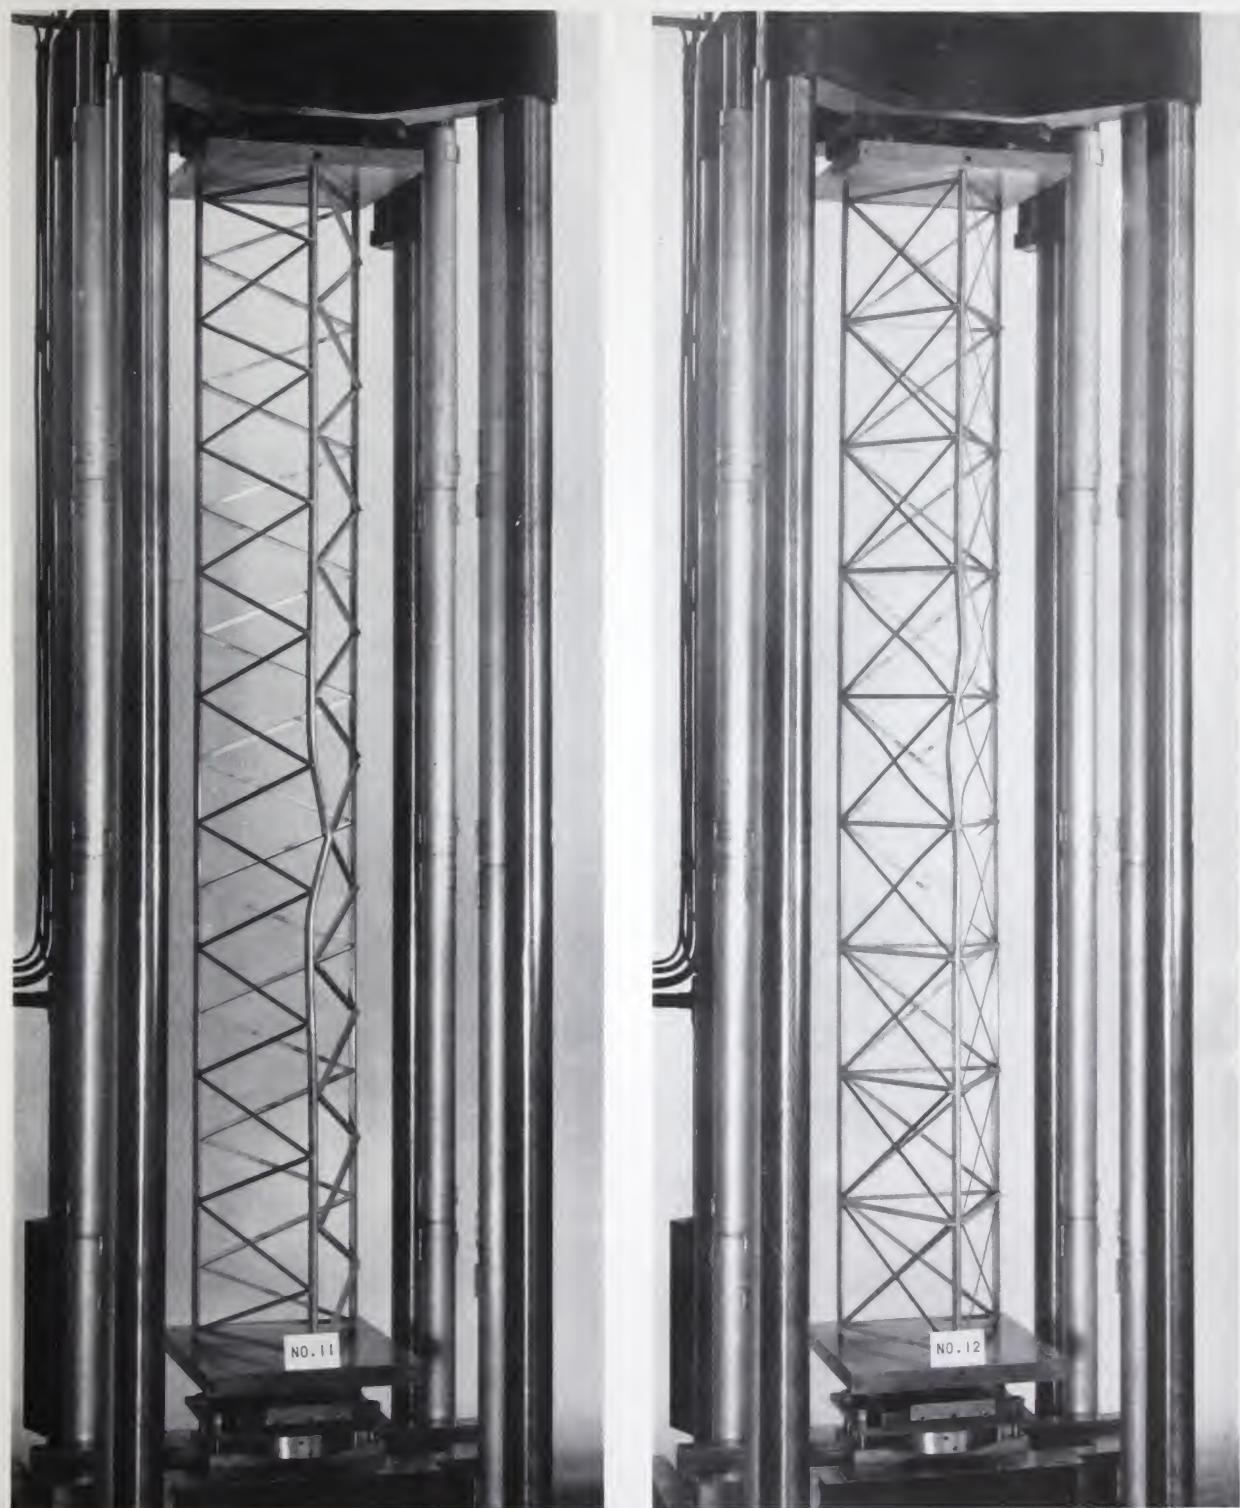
FRAMES NO. 11 AND 12 AFTER FAILURE IN COMPRESSION TEST.
